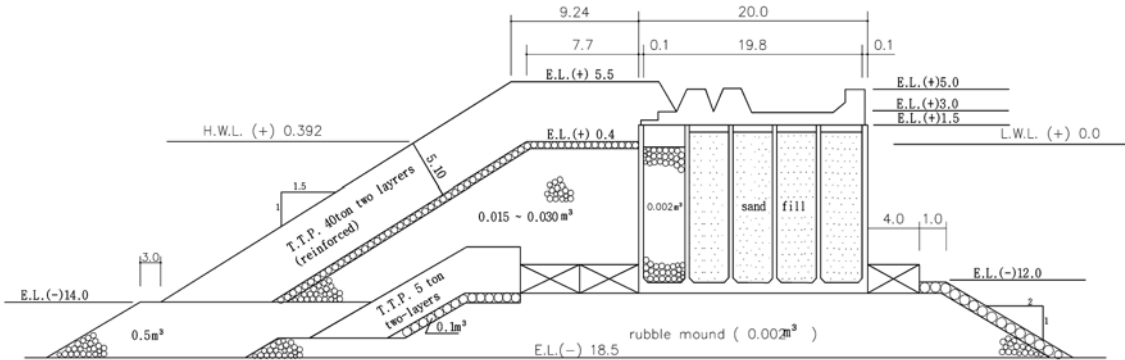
Cross-section of Section 11 after reinforcement (unit: m).
